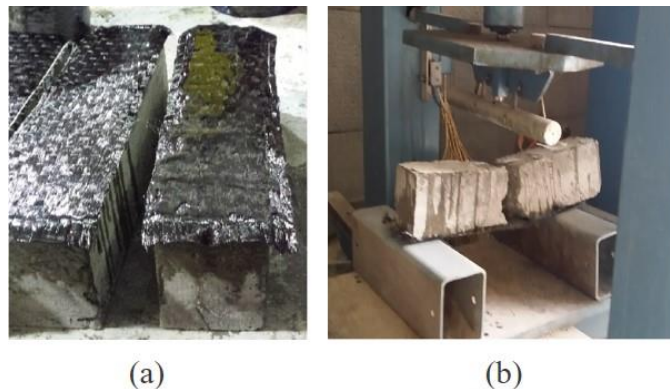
a) Retrofitted specimens, and b) Test (after failure).
